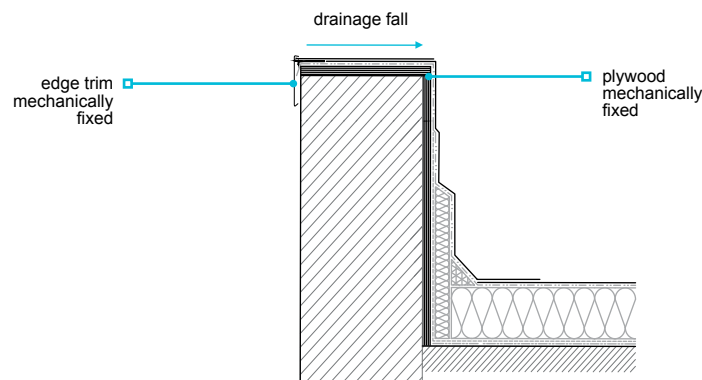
Parapet detail with waterproofing taken over top of wall and finished with edge trim
